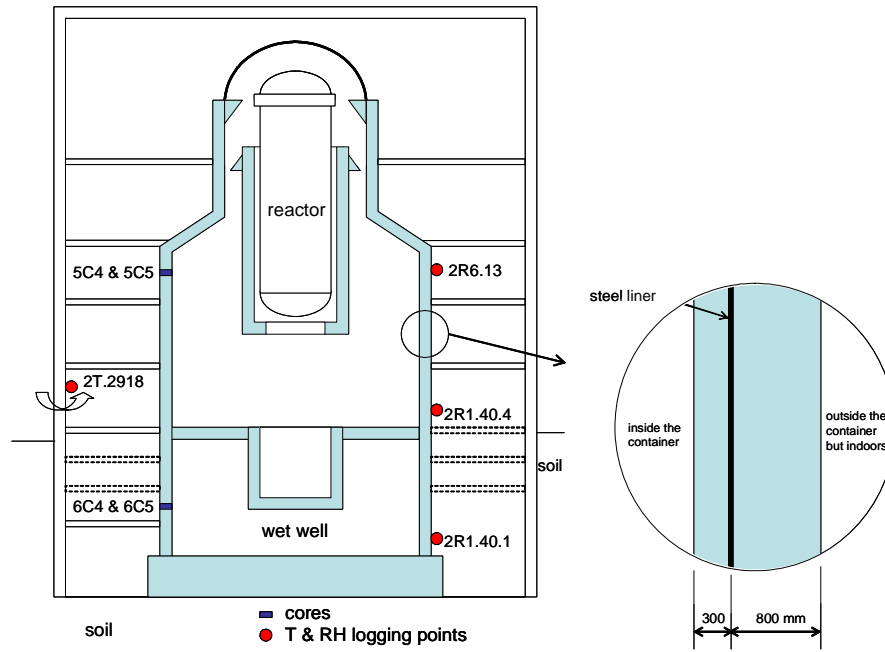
A general layout of a BWR containment with the measurement points (T, RH) and the coring points in a previous study [4] and a cross section detail of the wall showing the steel liner position.
